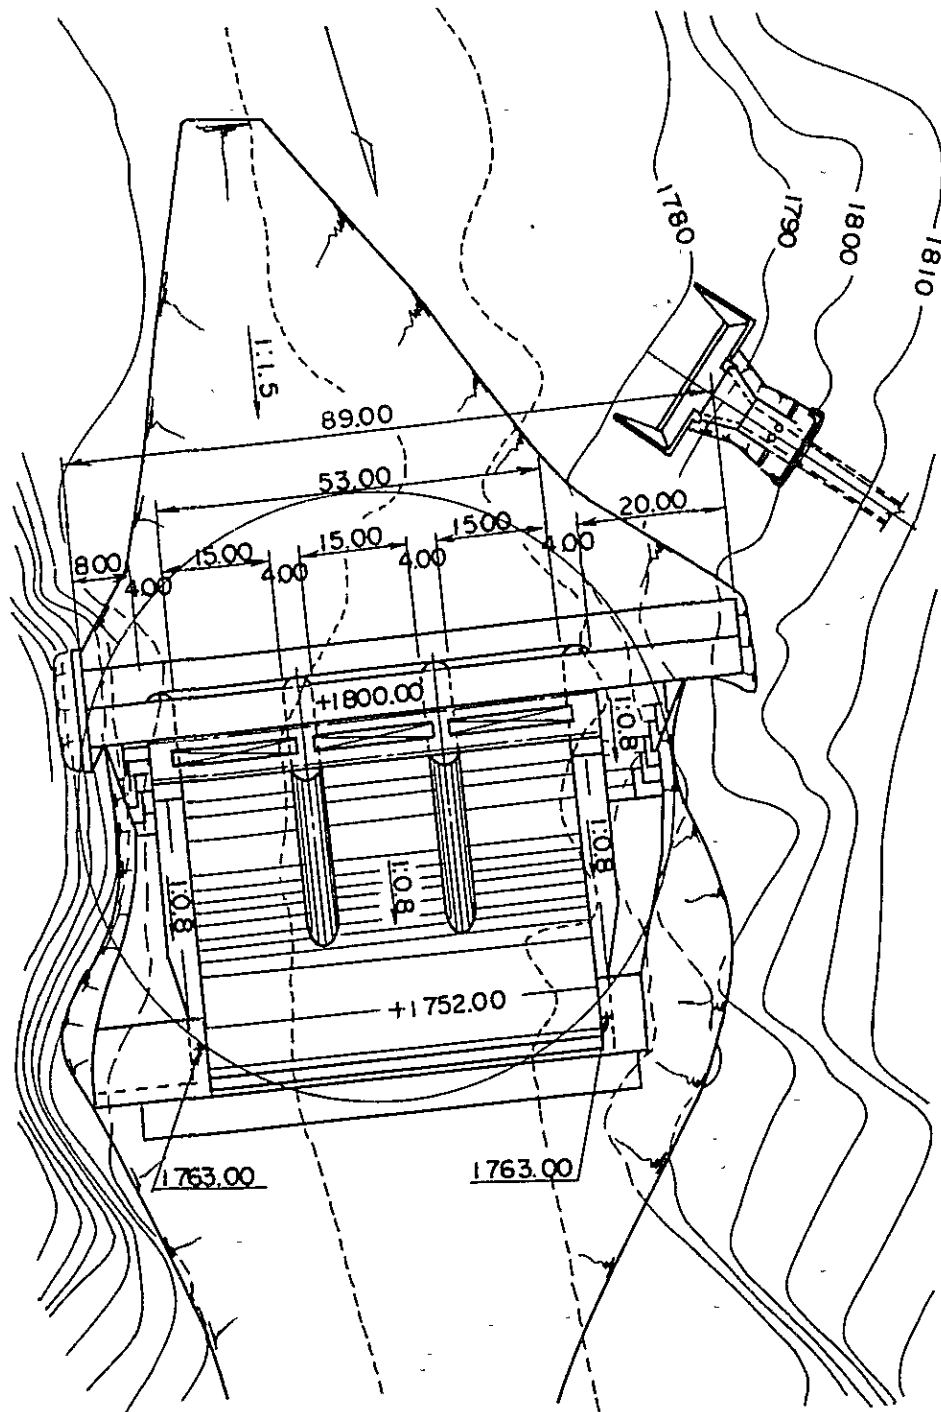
CONCRETE PLACEMENT AREA BY CLIMBING CRANE
